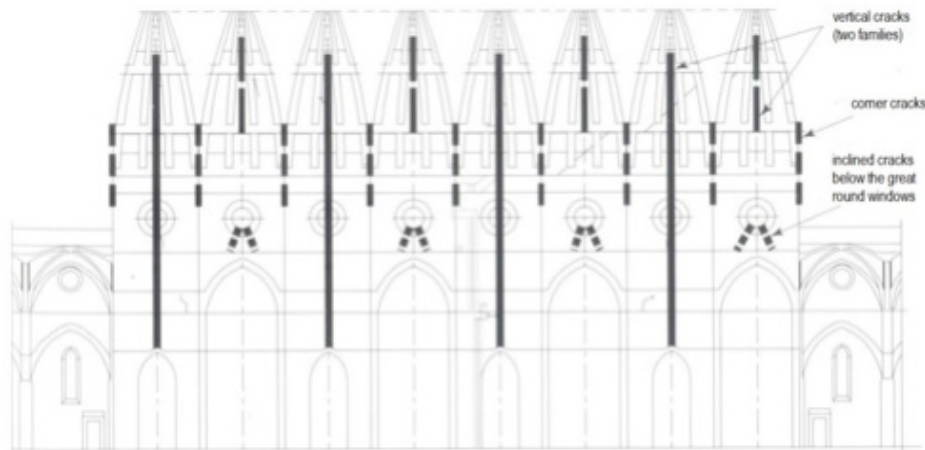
Exploded view of the surface of the dome interior indicating all types of cracking (Fanelli, 2004, [6]).
